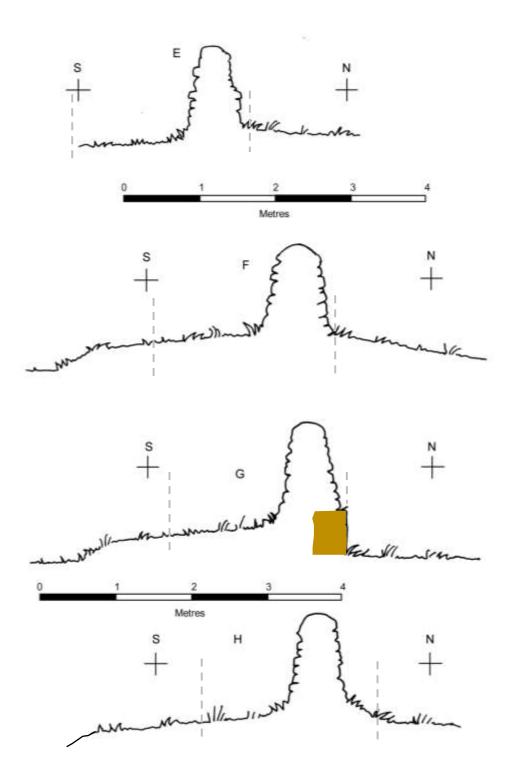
Post rebuilding profiles E to H across the Wall line. Roman facing stones in tone. Grey hatched lines indicate width and probable location of Narrow wall at E, F and H and established location at G.
